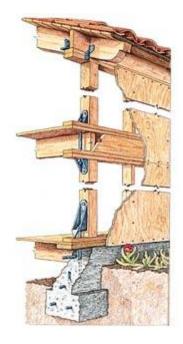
Hurricane strapping holding framing to foundation (Source Journal of Light Construction, 1997).
